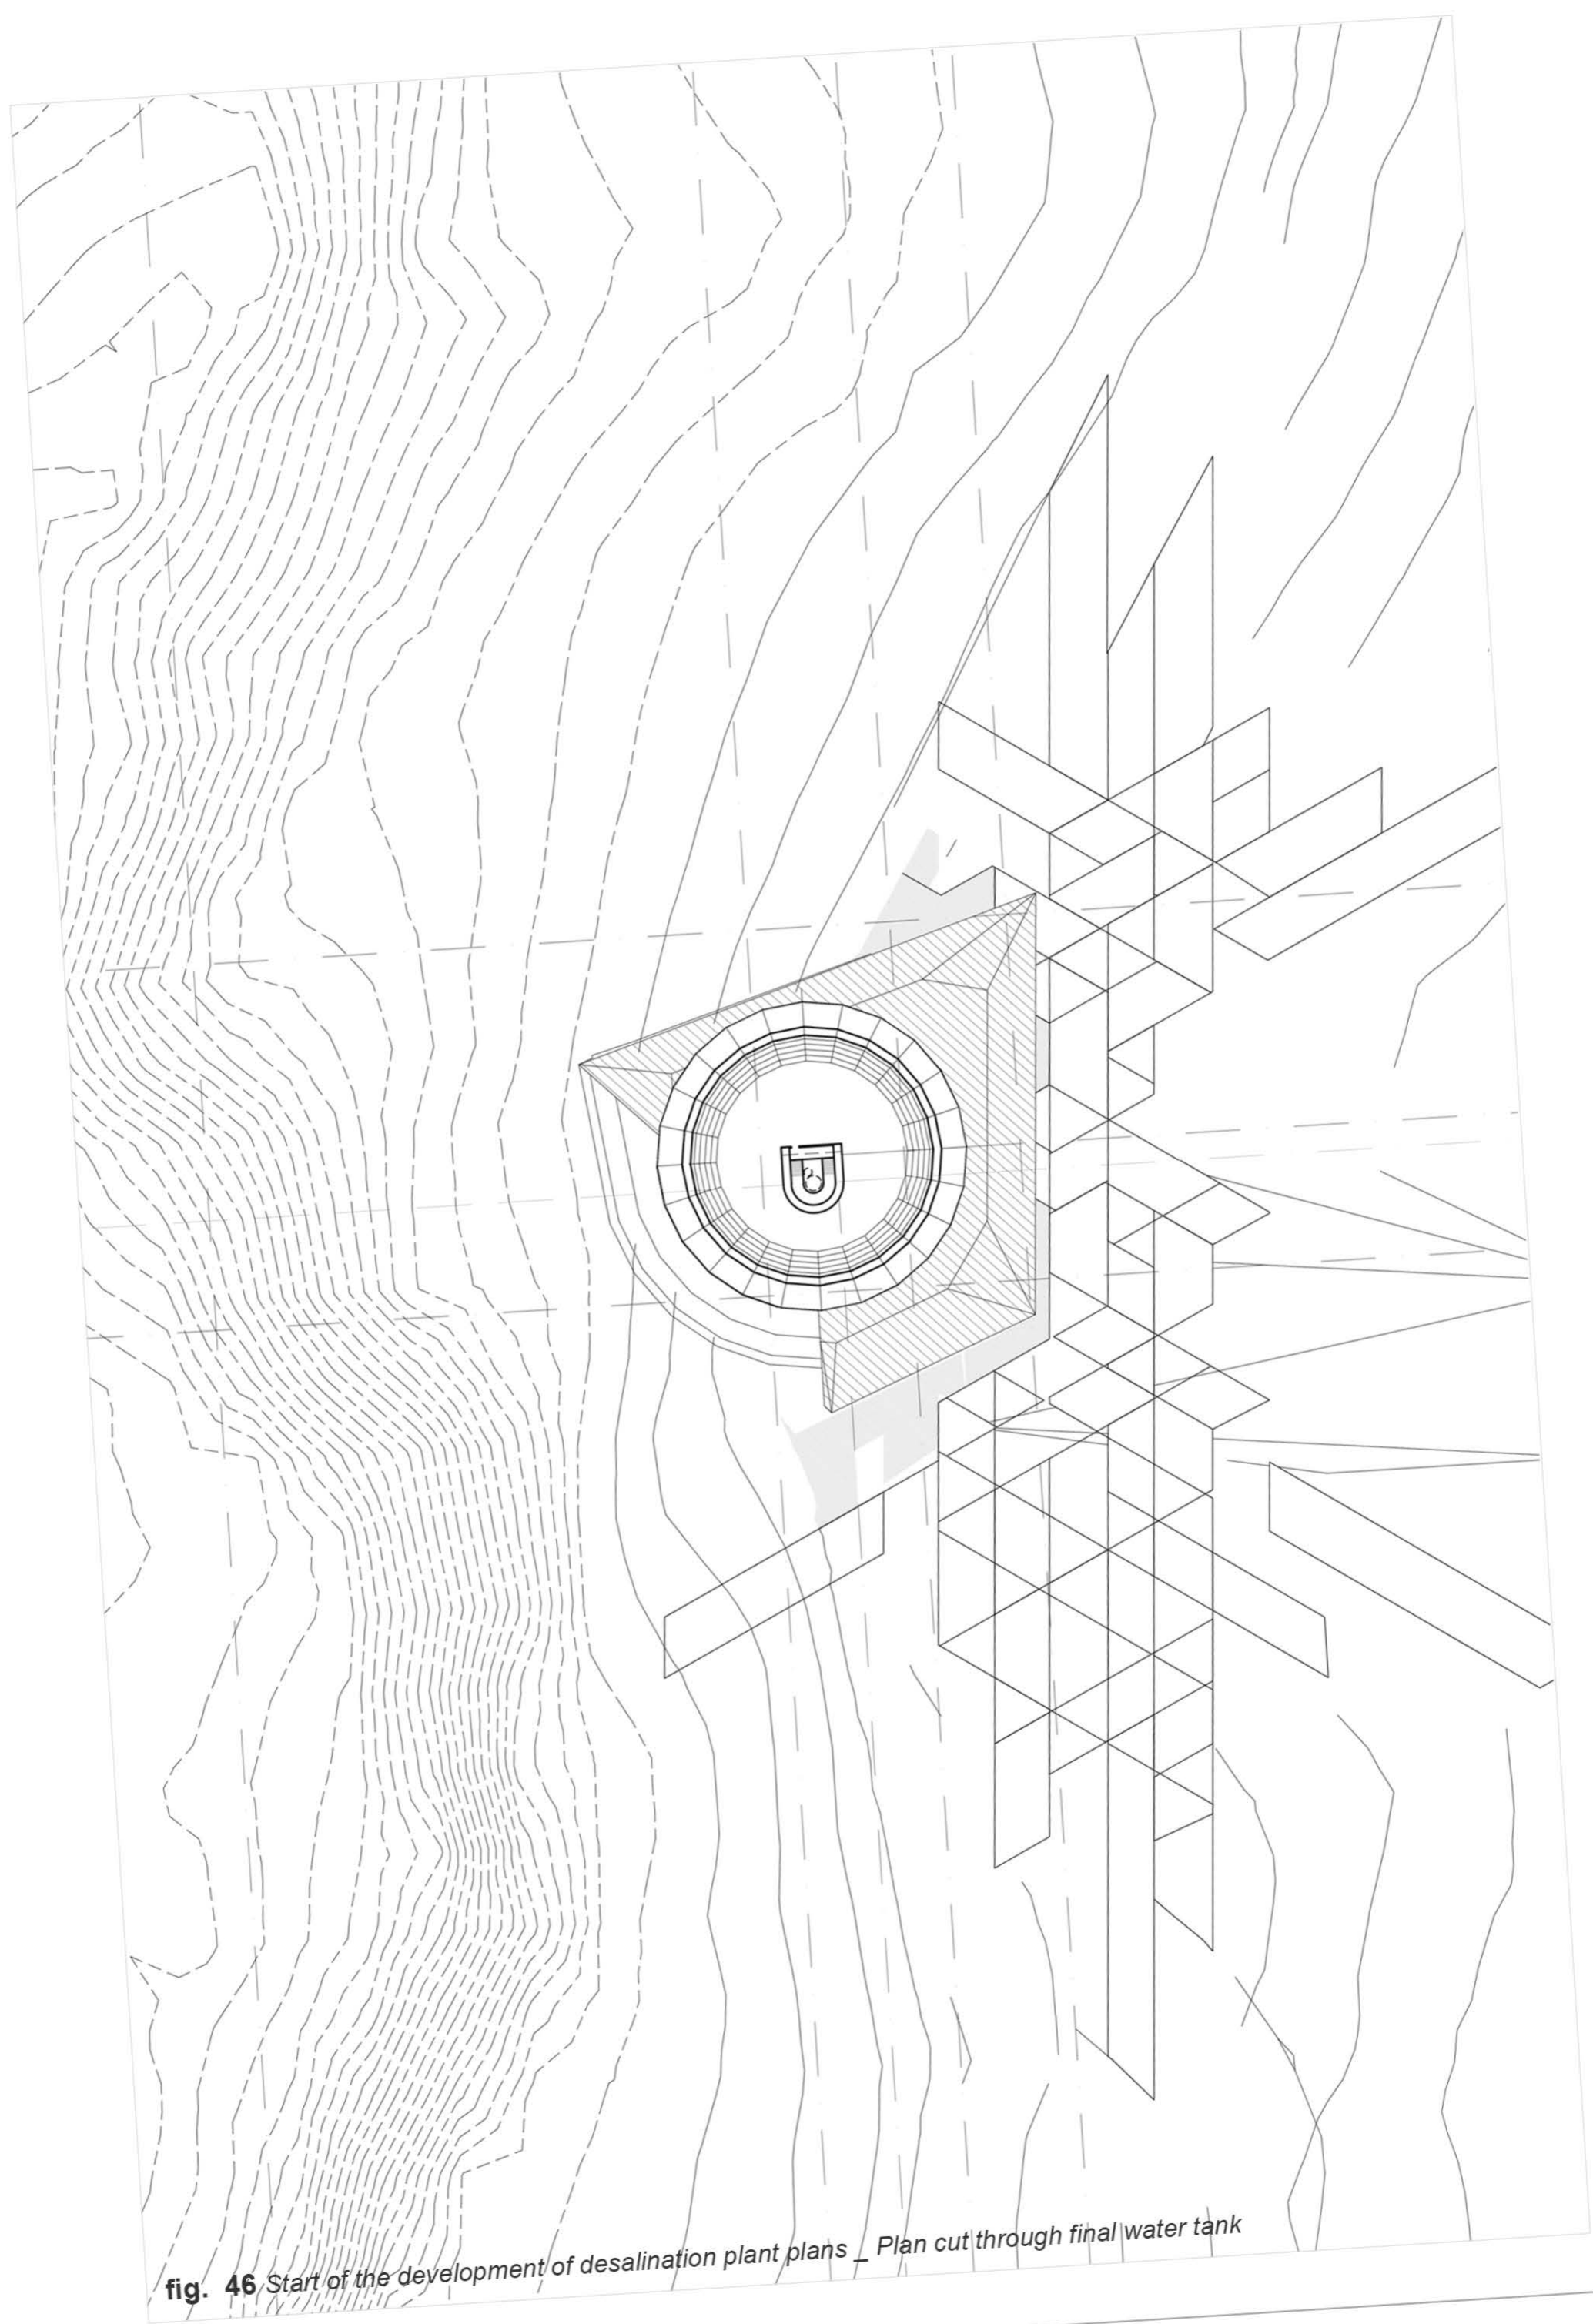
Start of the development of desalination plant plans _ Plan cut through final water tank
